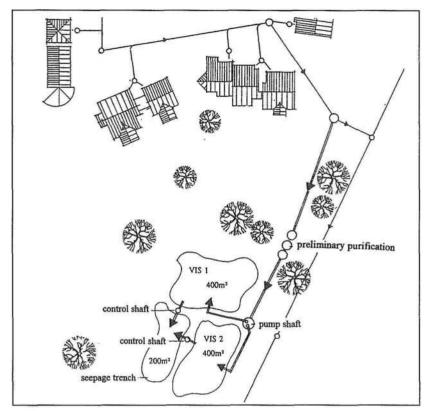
Site plan of a VIS¹⁸ reed waste water treatment installation Source: Büro Bültmann
